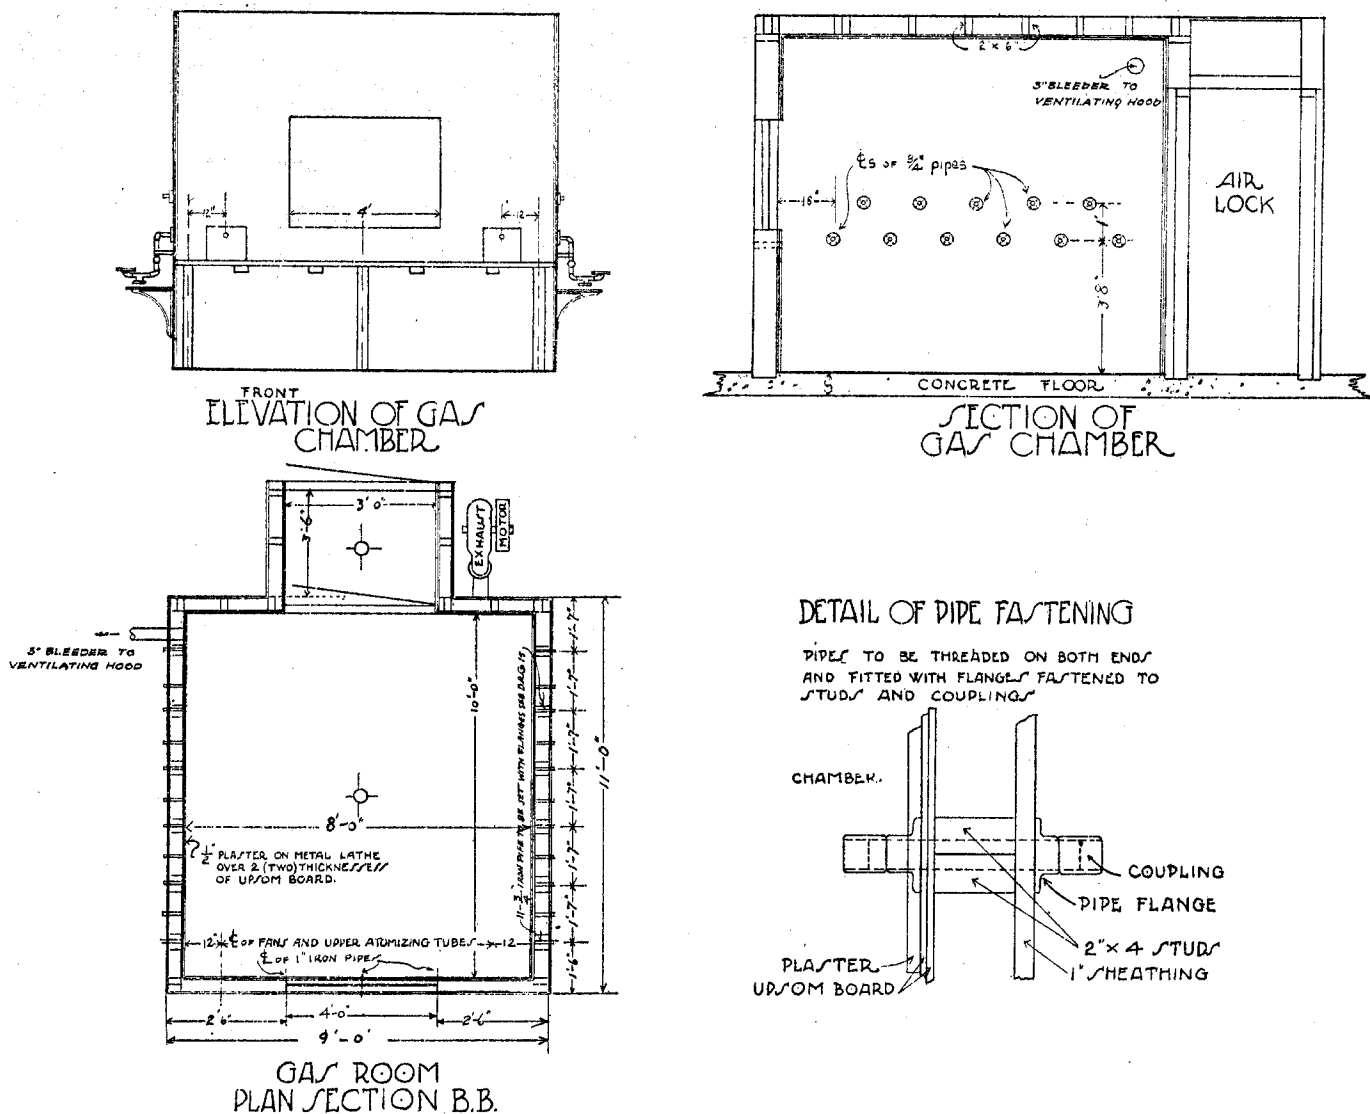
FIG. XII—ELEVATION AND PLAN OF GAS CHAMBERS
